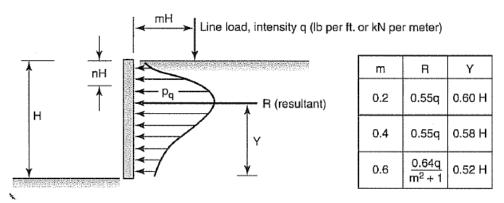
Pressure distribution against vertical wall resulting from line load of intensity q.
